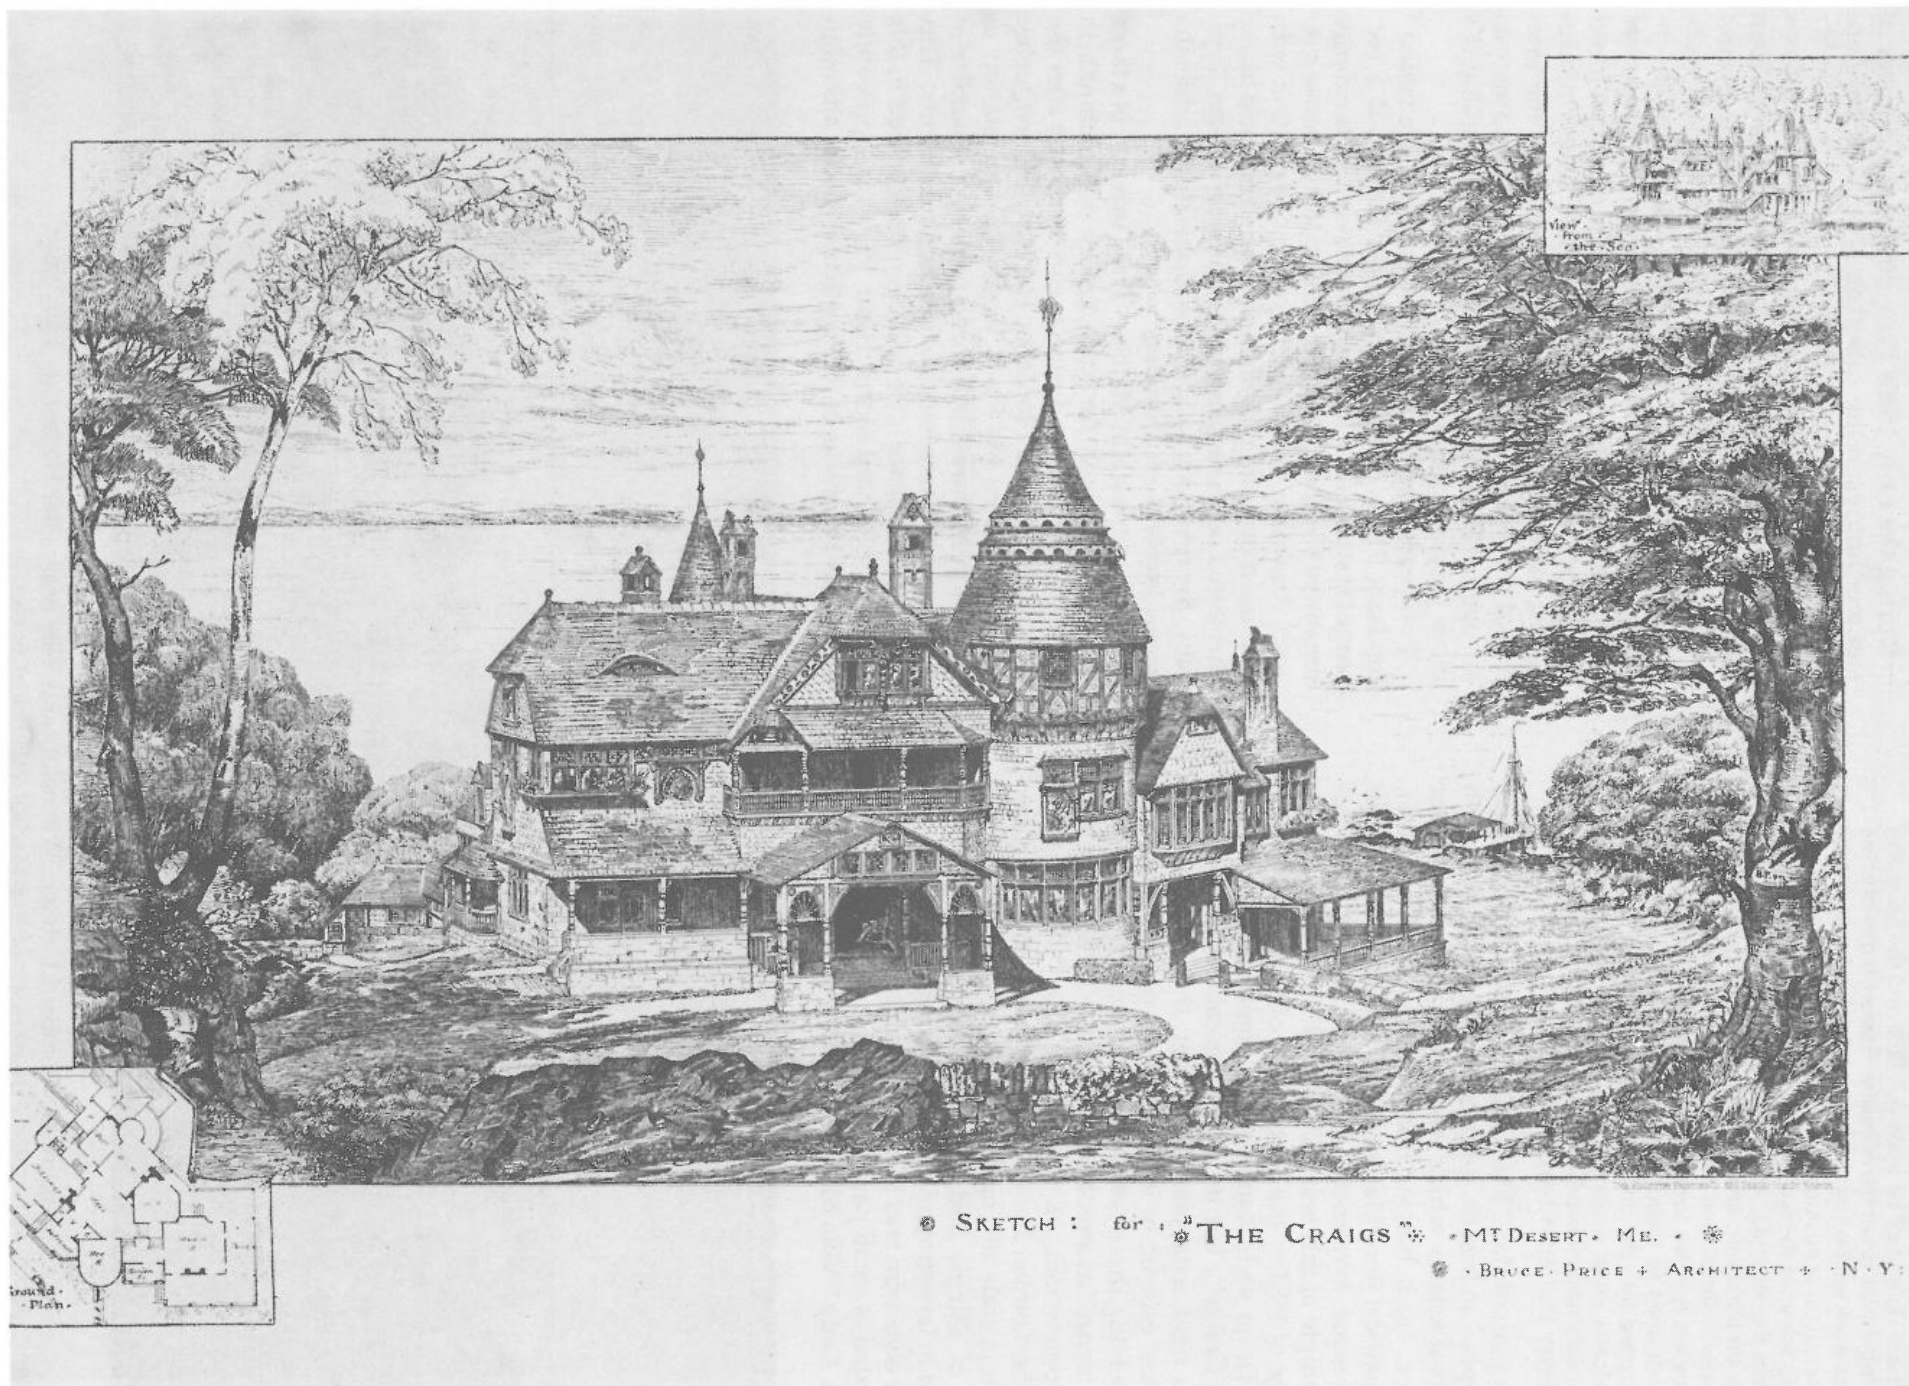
Sketch for The Craigs, *American Architect and Building News*, December 27, 1879 (SPNEA, Boston).
